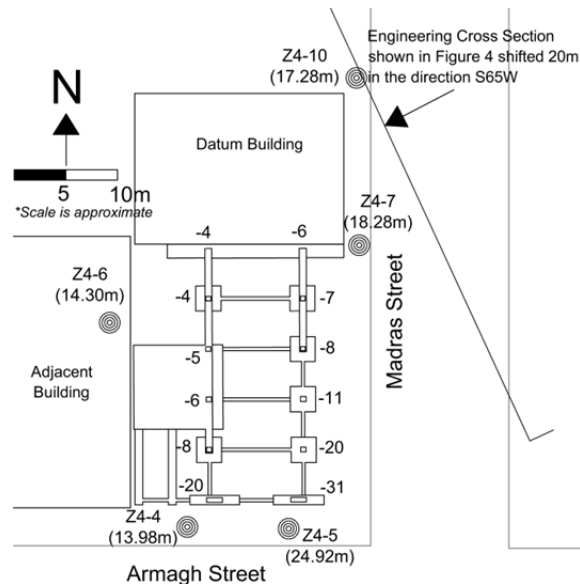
CTUC Building site with its foundation system and CPT locations (with depths). Footing settlements at column locations relative to the datum building are provided in cm.
